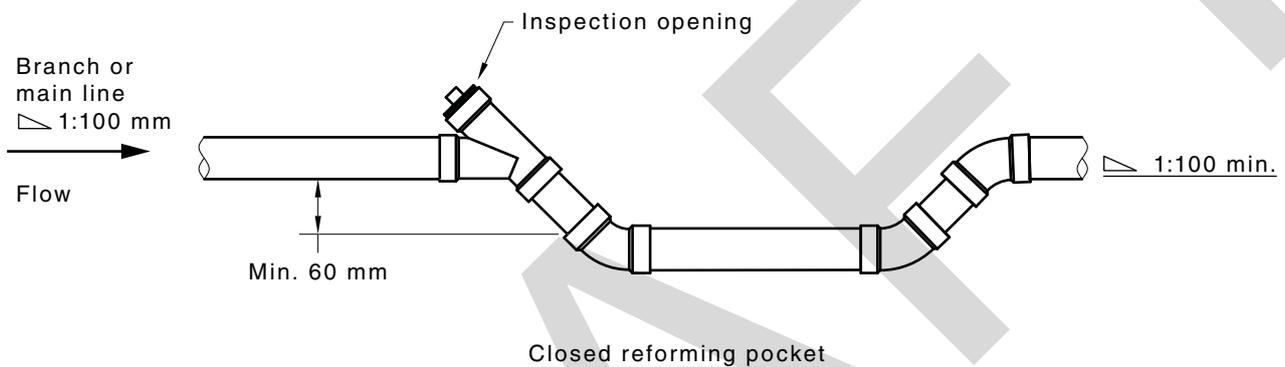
TYPICAL CLOSED TYPE VACUUM REFORMING POCKET
